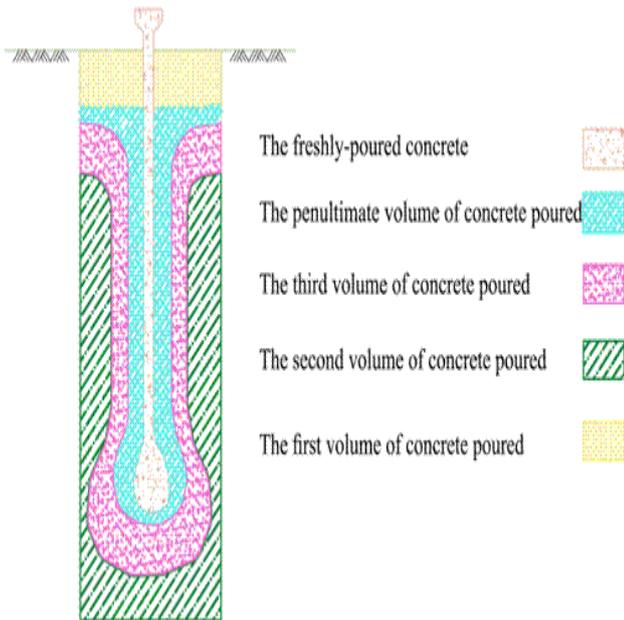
Concreting Section of the Modeled Panel using Color Concrete
